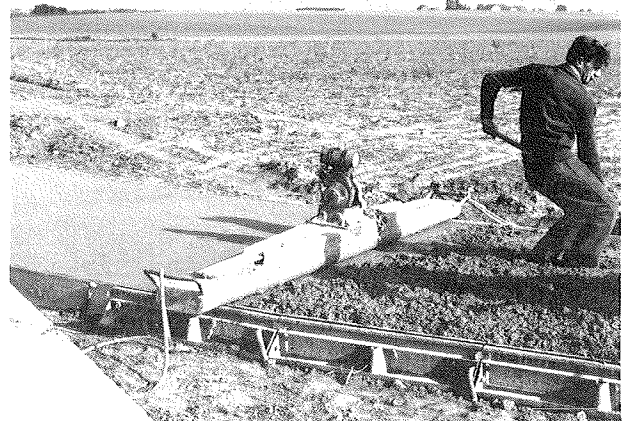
Manual application of concrete by means of a vibrating beam.
